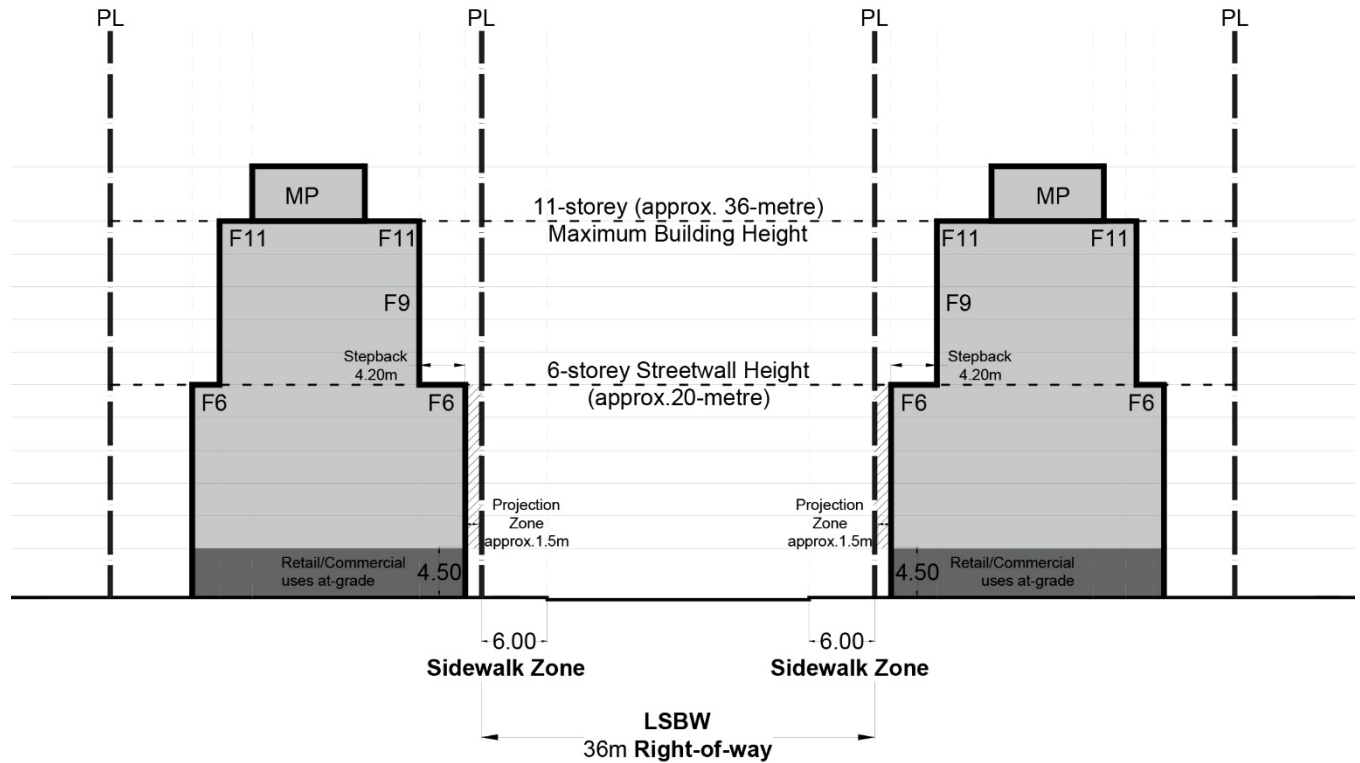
Demonstration of an 11-storey mid-rise building with a 6-storey street wall
